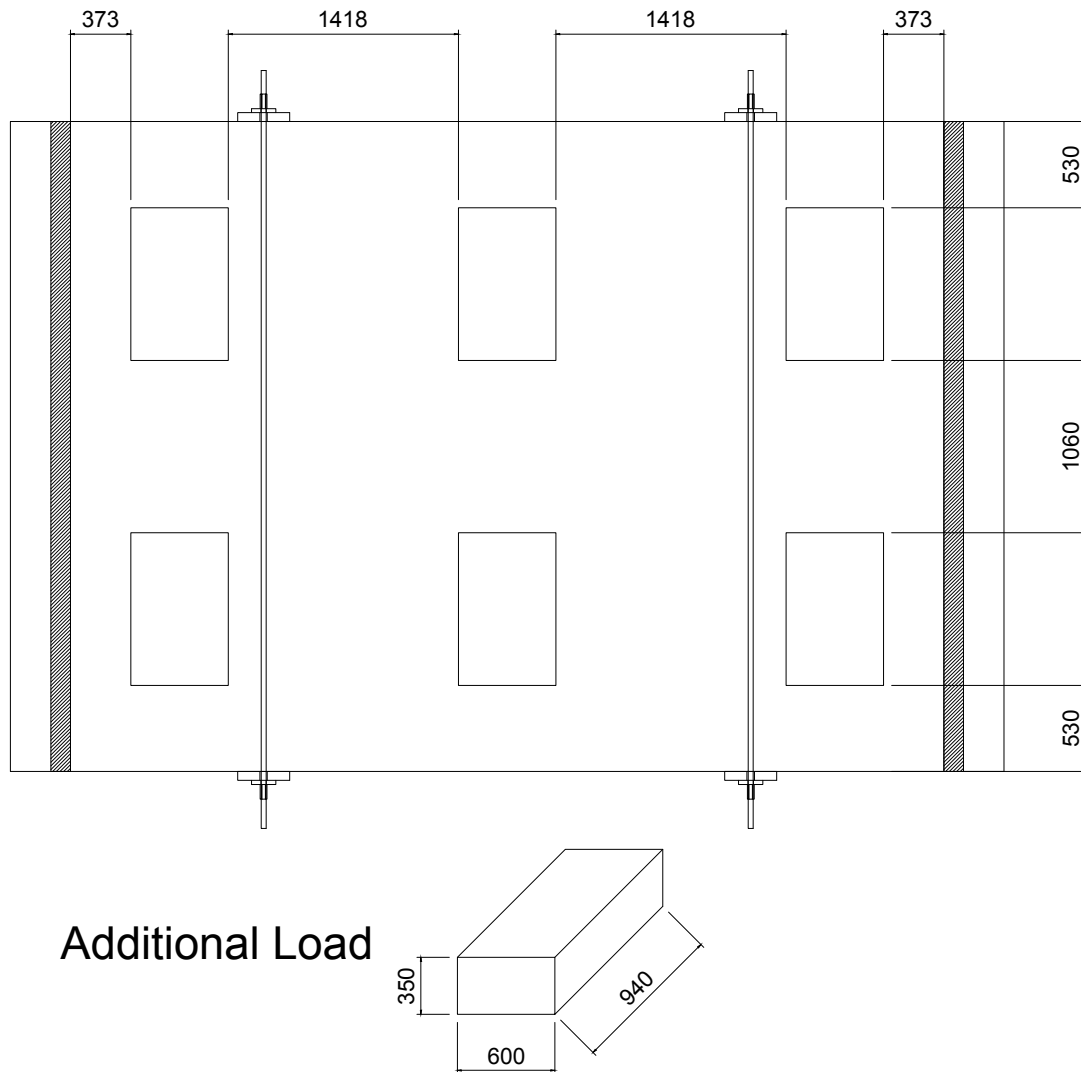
Number and position of concrete masses for additional gravity load – second floor slab.
